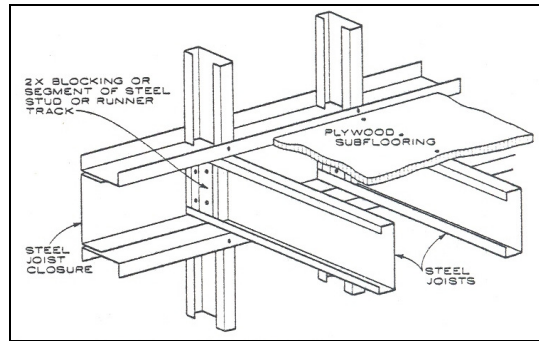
"Light-gauge steel framing (Ramsey, 1981) [12]"
